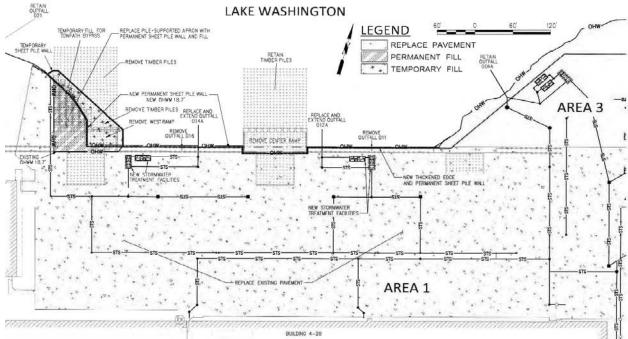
Plan drawing of West Apron R (Area 1) that shows the general construction plan (Adapted from Wood 2019a Figure 3).
